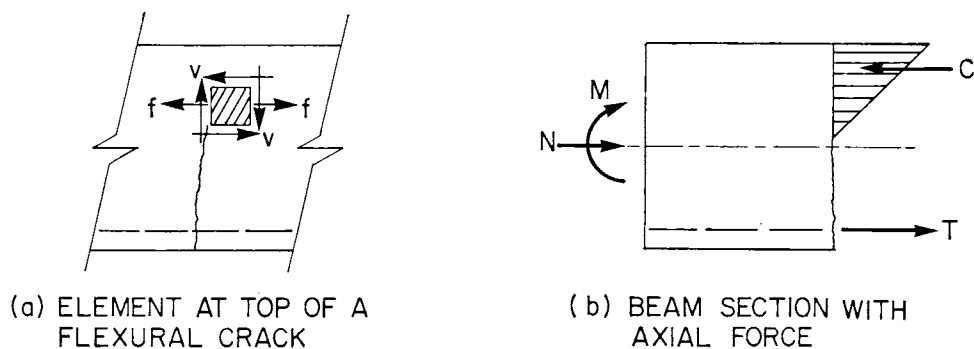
Force systems used in derivation of inclined cracking equations for reinforced concrete beams
